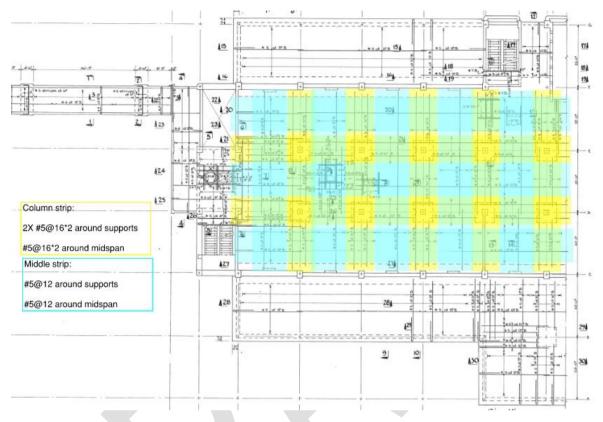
Floor reinforcement (first floor - bottom reinforcement)
